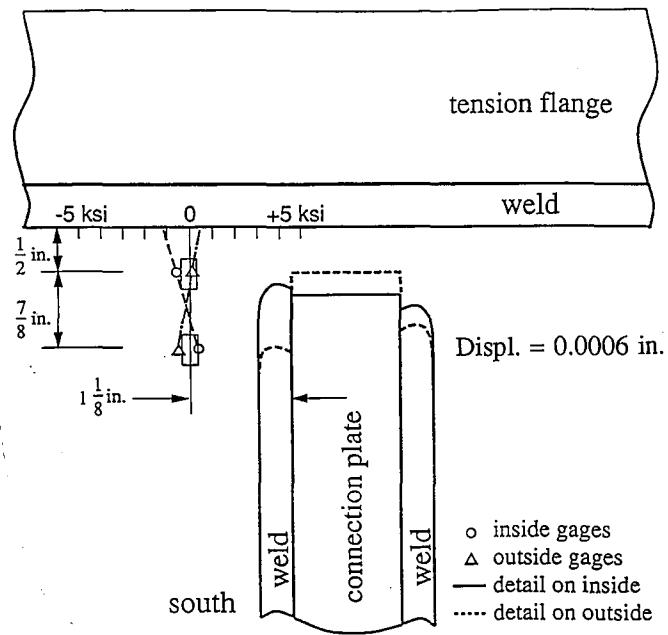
Static Stress Distribution on Outside Girder at Pier S5-2 (84 in. Girder) Before Retrofit with Dump Truck in Outside Lane (Worst Case)
